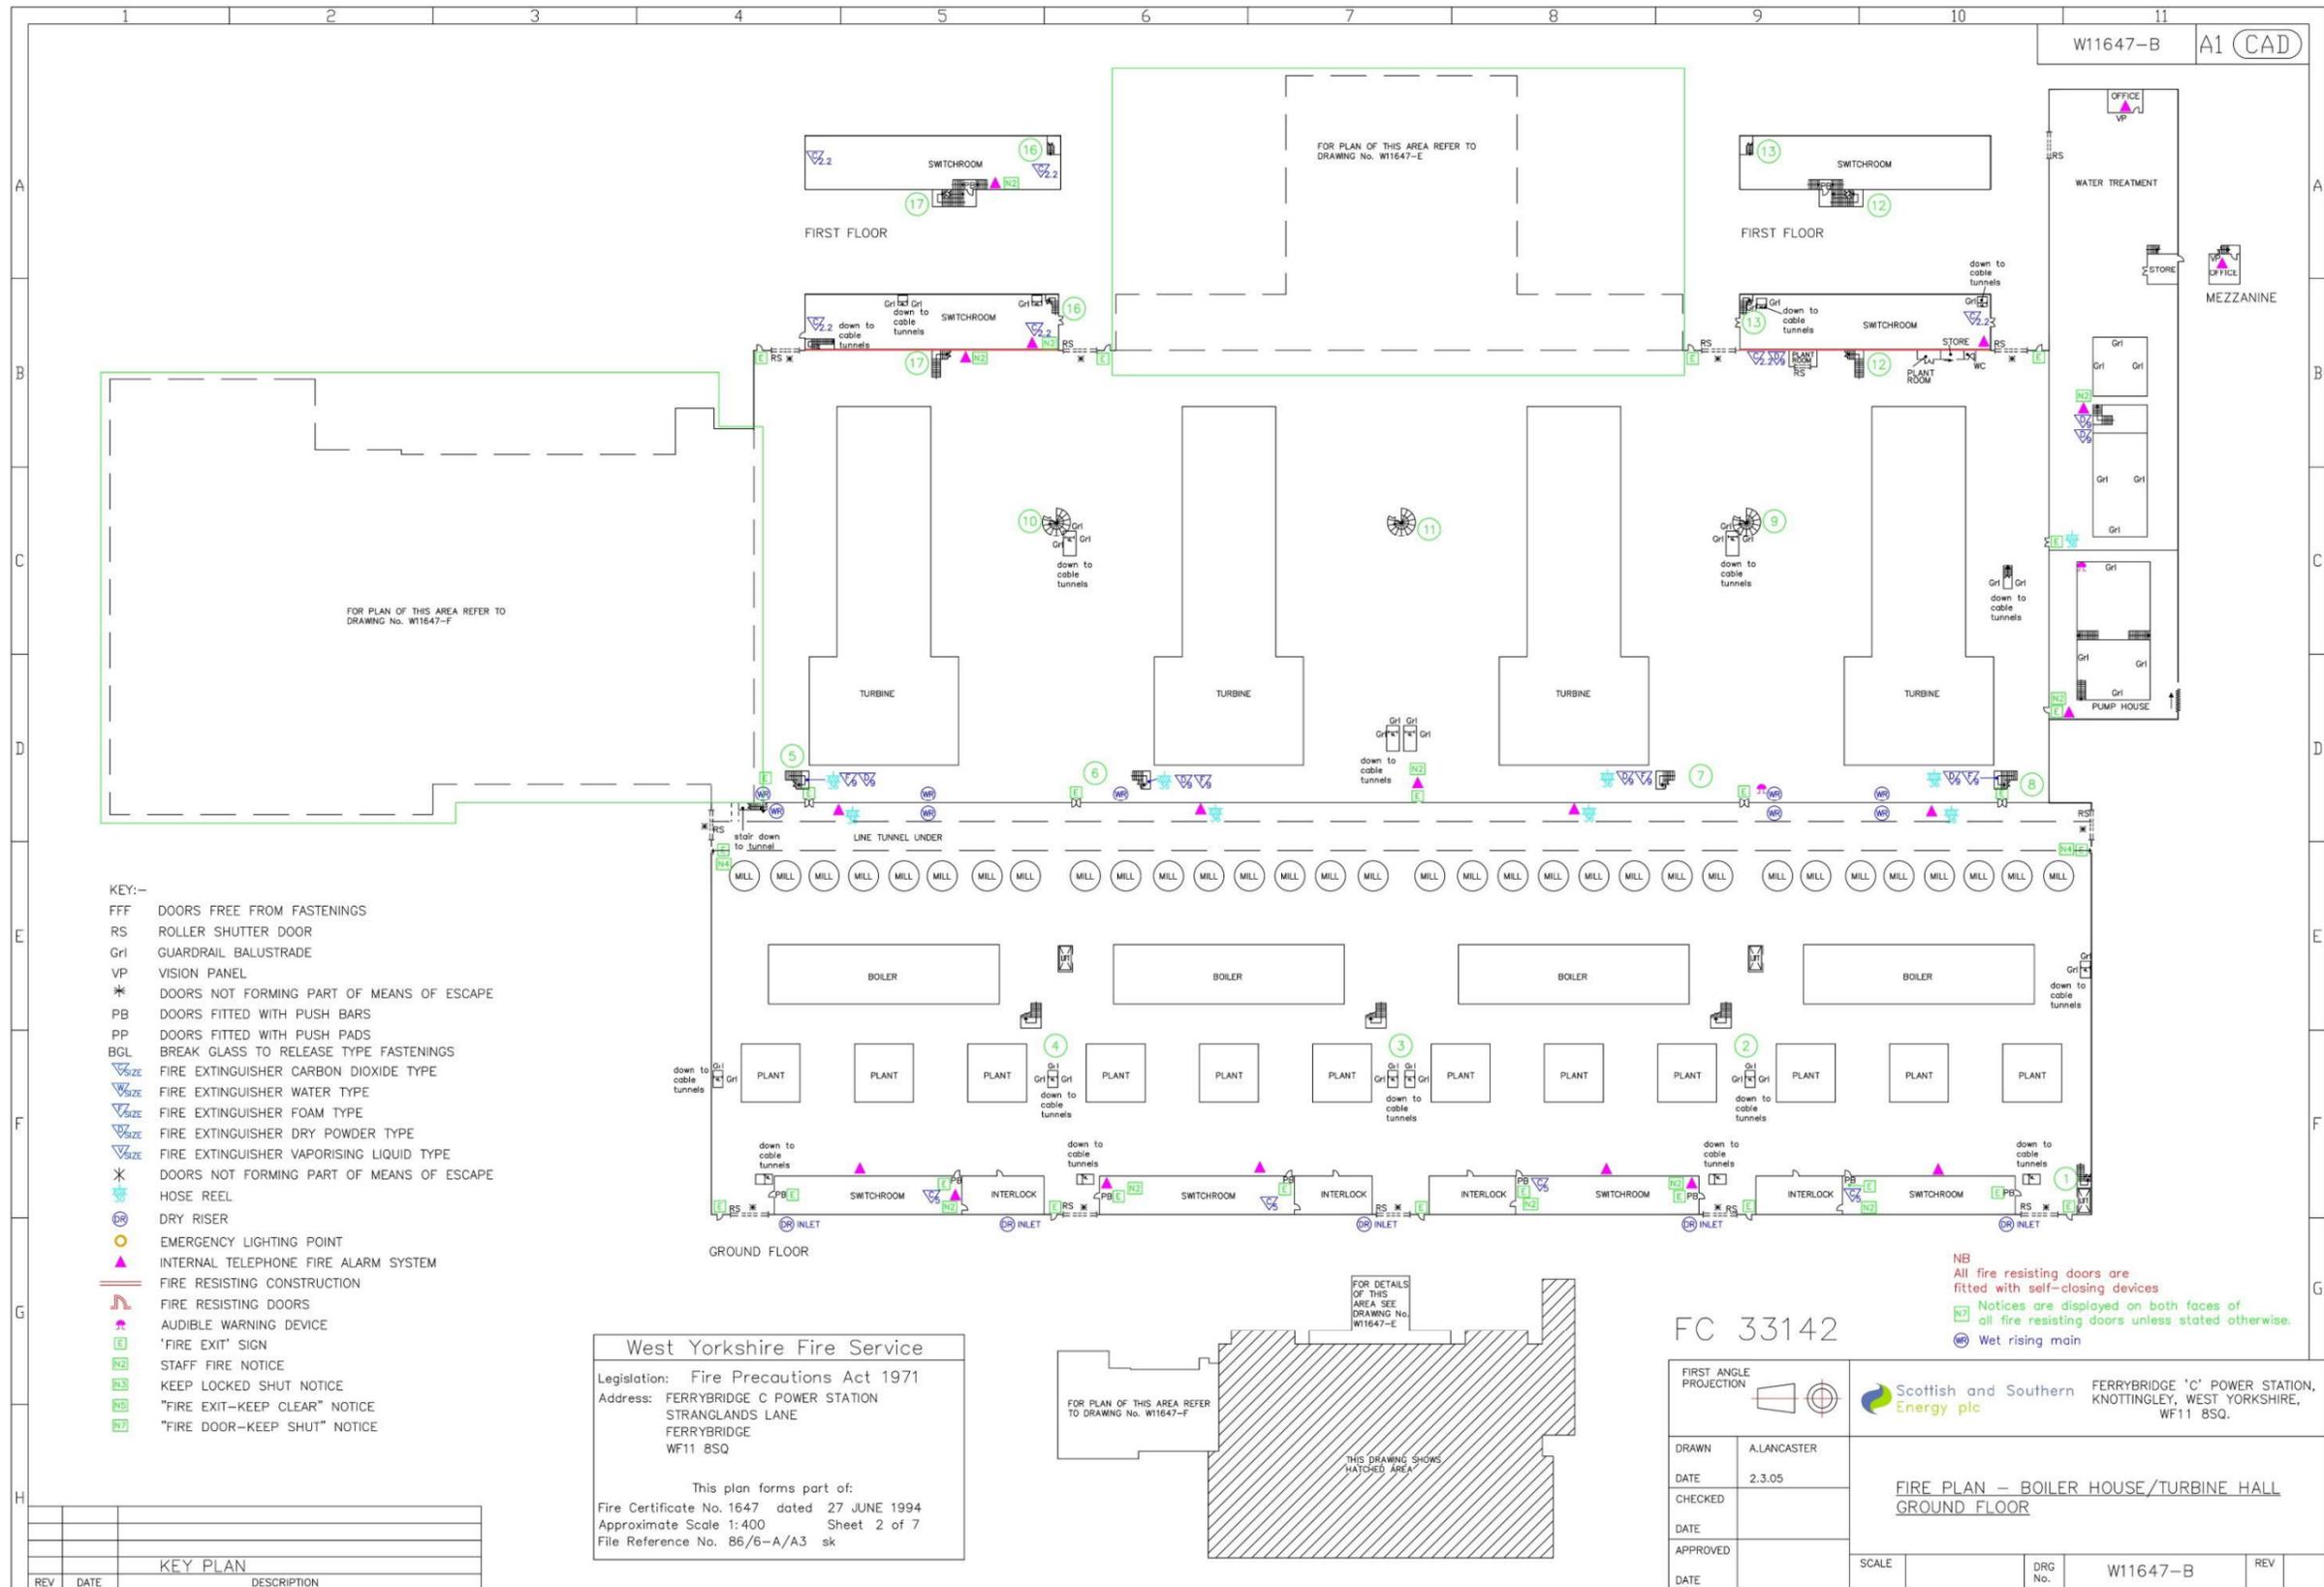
Ground Floor plan of the main station buildings showing the Mill Bay, Boiler House and Turbine Hall.
